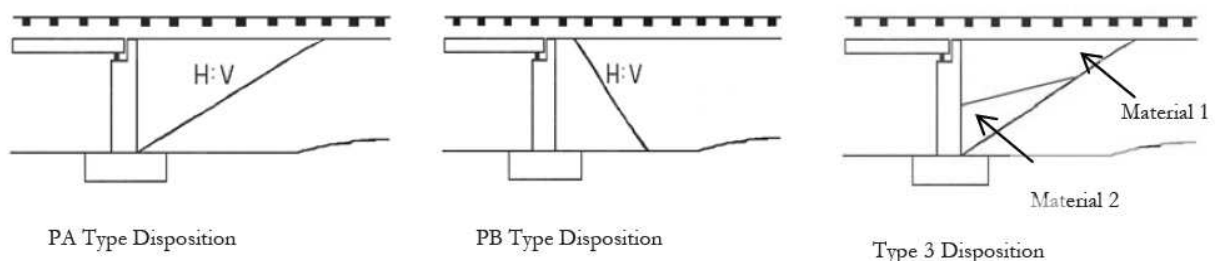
Types of dispositions of the backfill behind the abutment in embankment-structure transitions.
